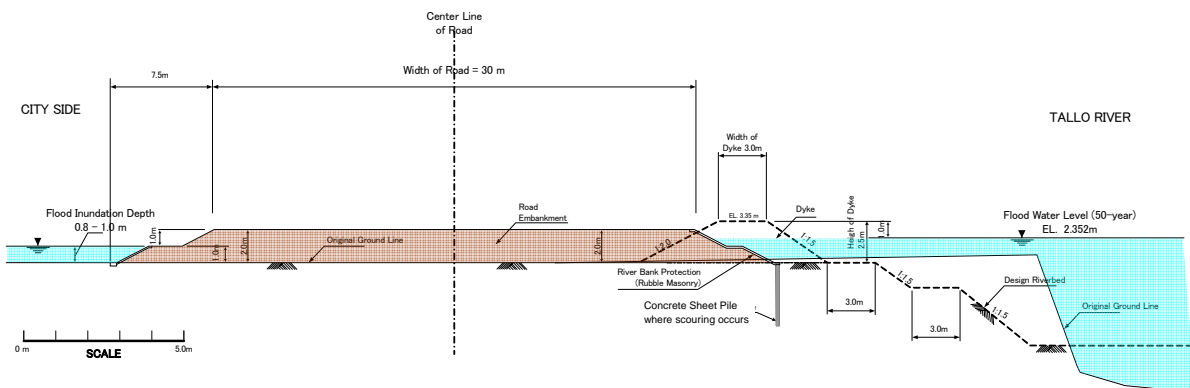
Typical Cross Section for Tallo River Flood Area (Type 4)
